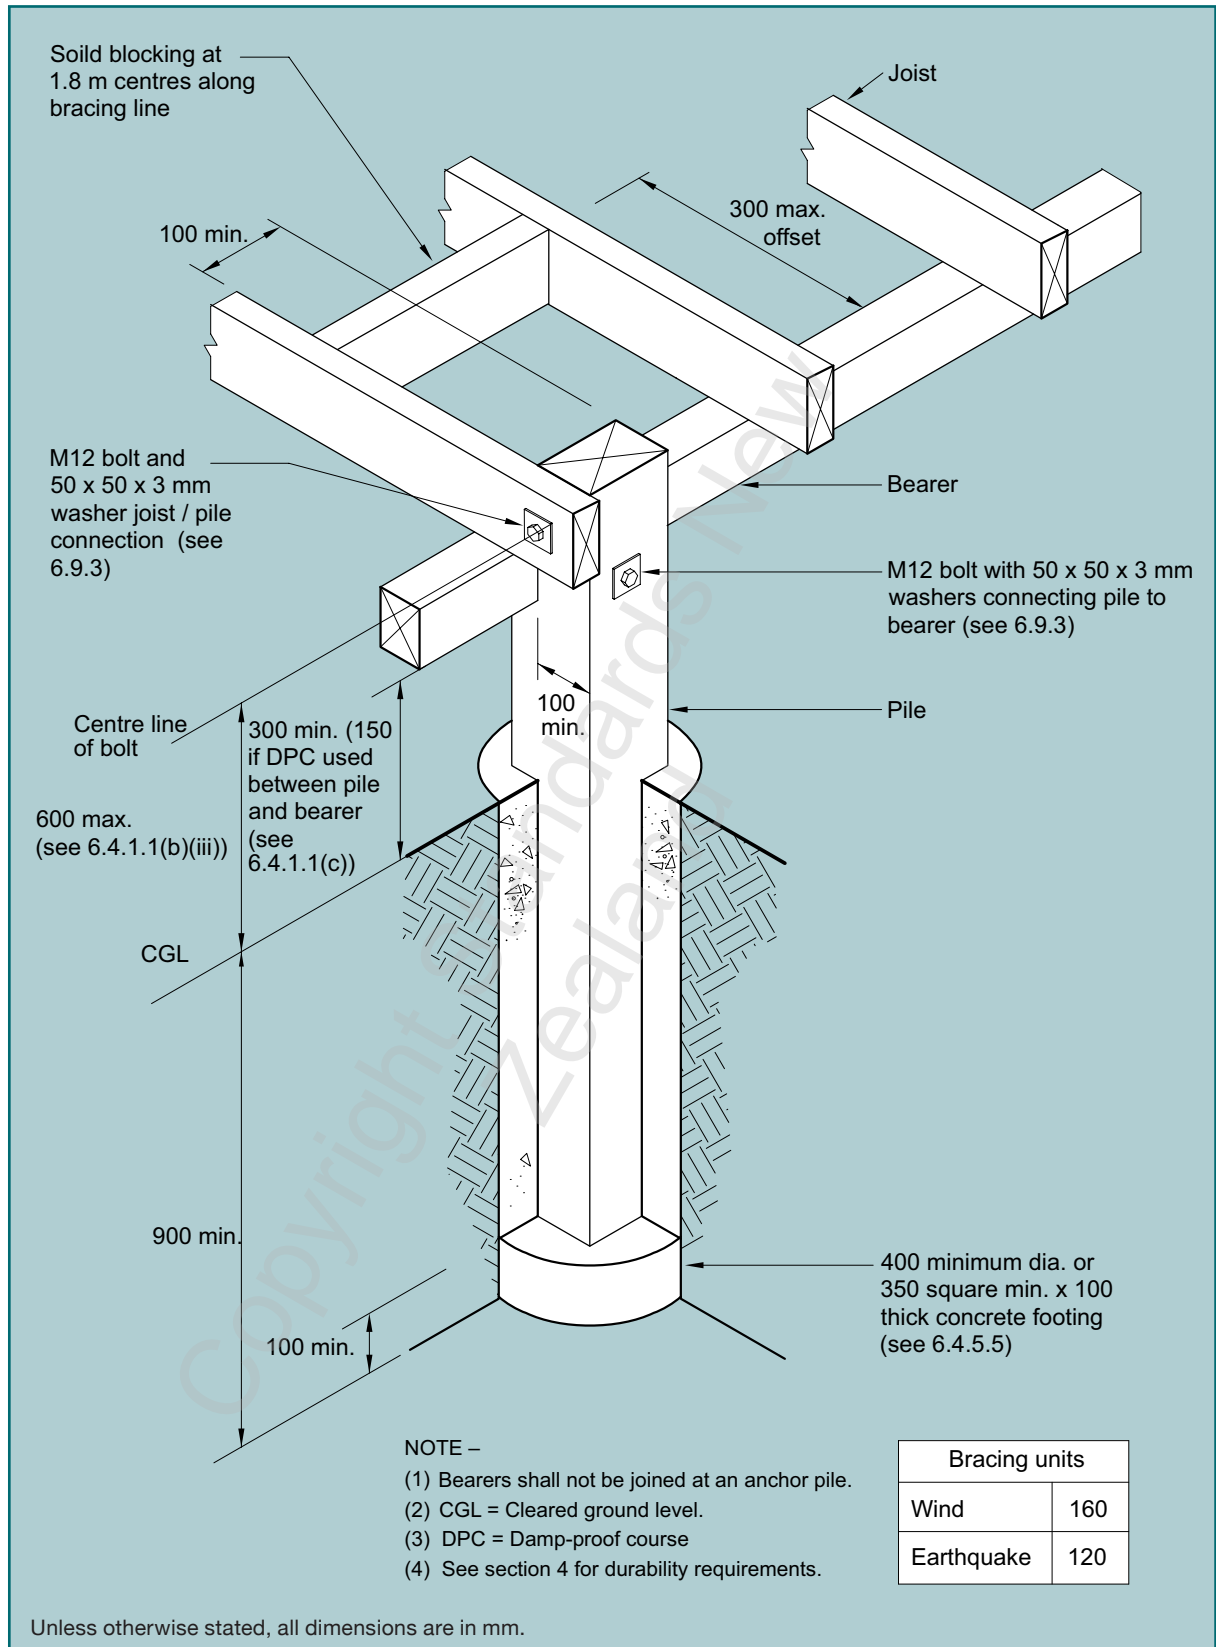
Anchor pile directly connected to joist and bearer (see 6.9)
